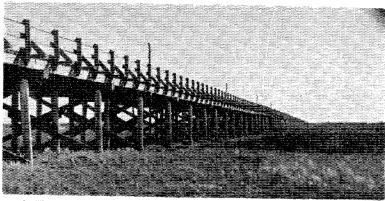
The bridge at Grouard is reputed to be the longest wooden bridge in Alberta.
